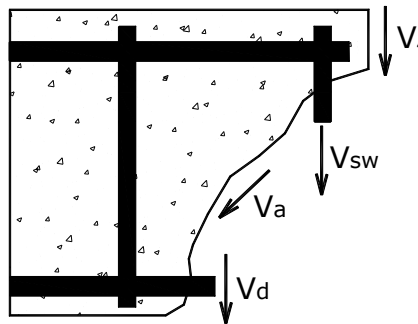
Cracked reinforced concrete member and shear force portions
